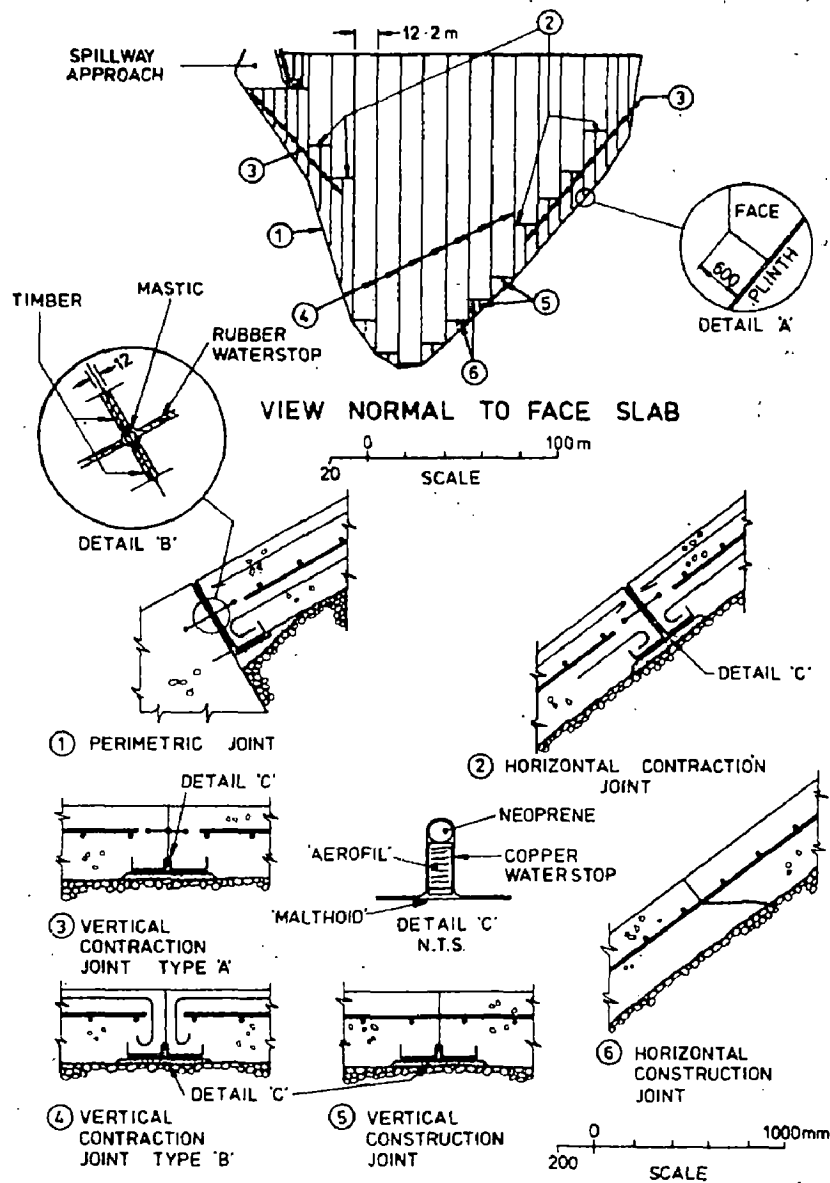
Cethana dam face – Joint layout and details (at (6))
